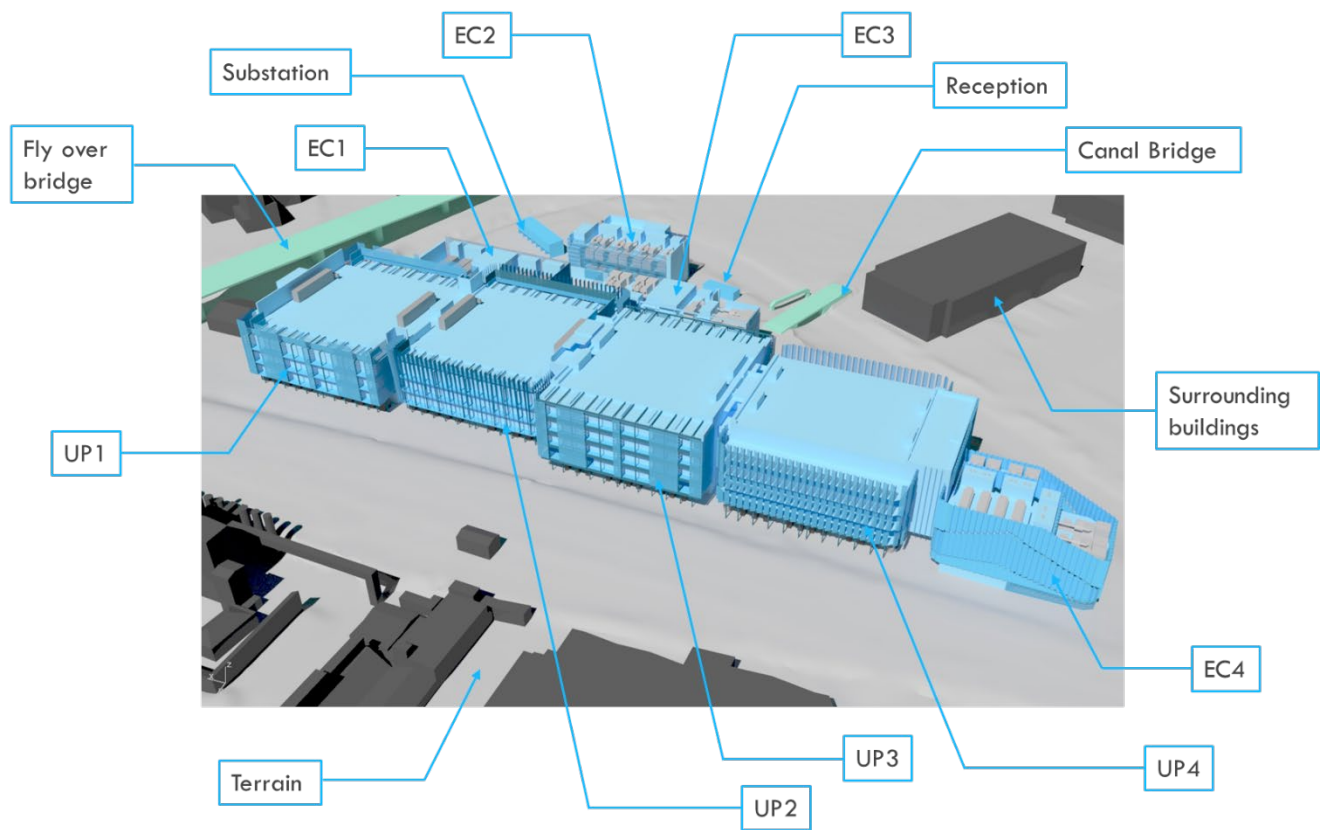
South close-up perspective view of the modelled proposed Union site and surrounding buildings.
